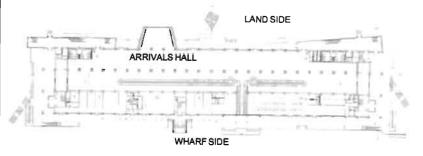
Mezzanine floor plan showing arrivals hall. (Dalco. 2003: 26)
